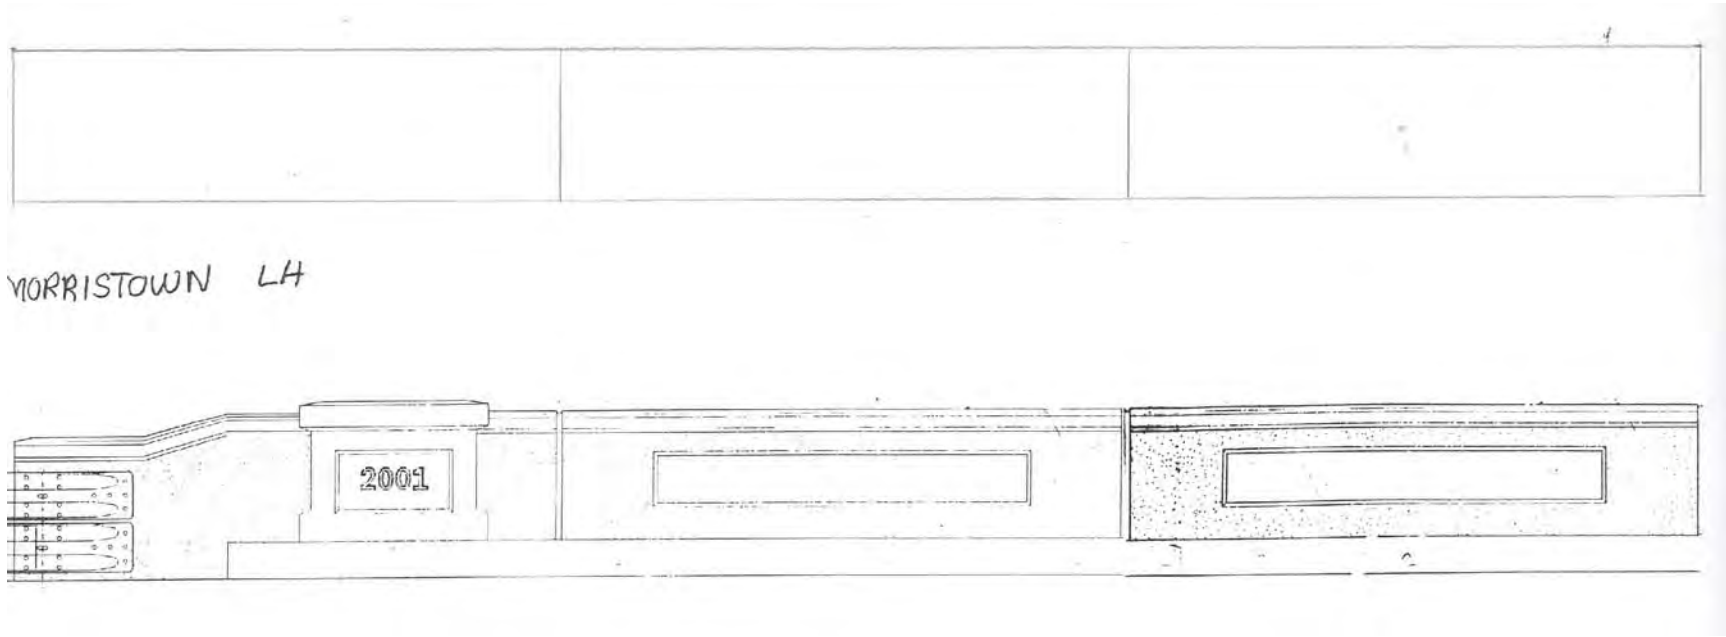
Blank crack mapping diagram of a solid bridge rail.
